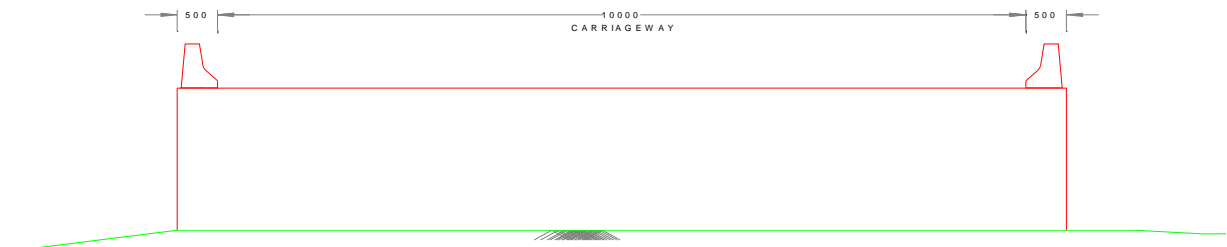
TYPICAL CROSS SECTION- TYPE-8
